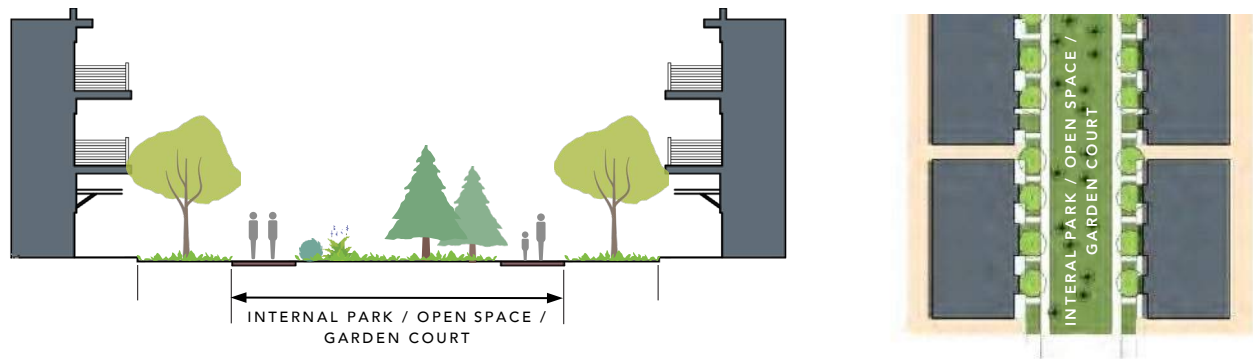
Example of internal parks, open space, or garden court frontage
